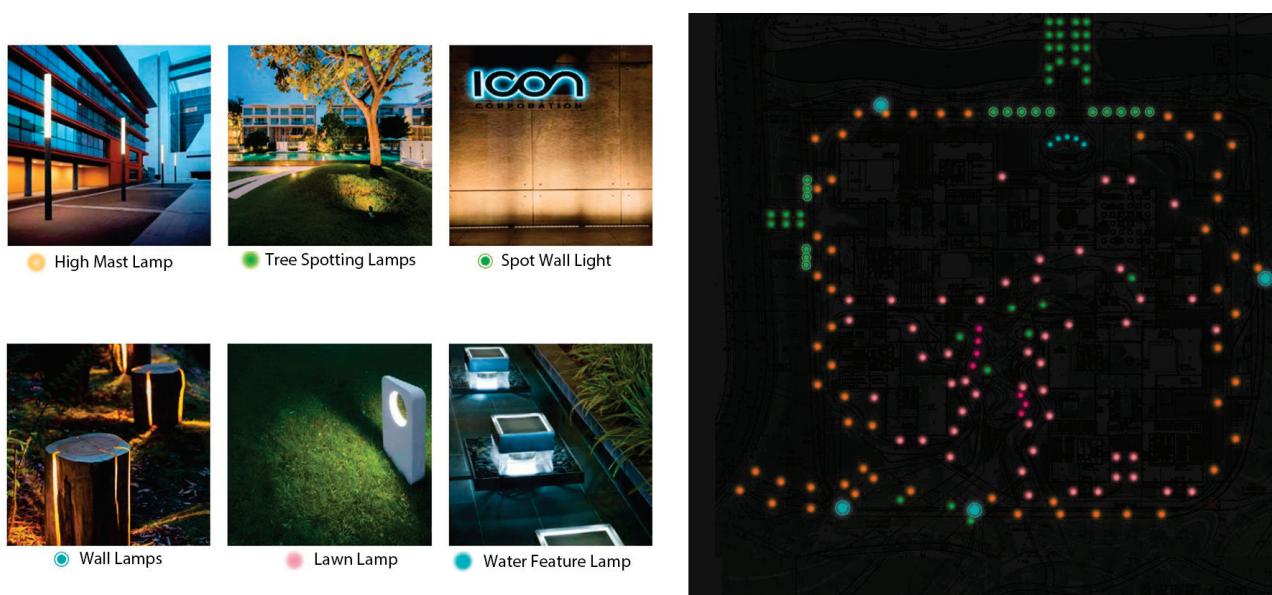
Rooftop garden plant landscape lighting design analysis diagram.
